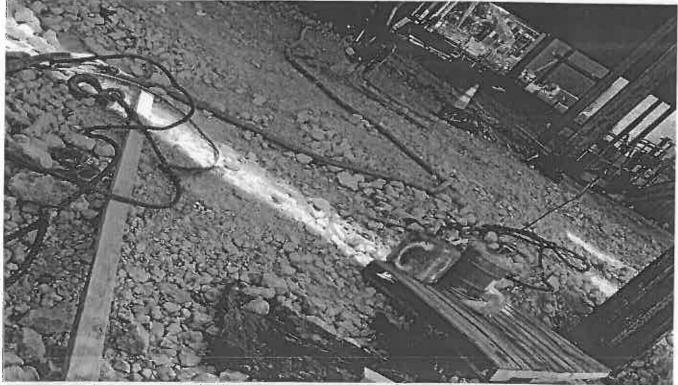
Ongoing pumping of muddy groundwater from foundation footing into active stormdrain onsite.
